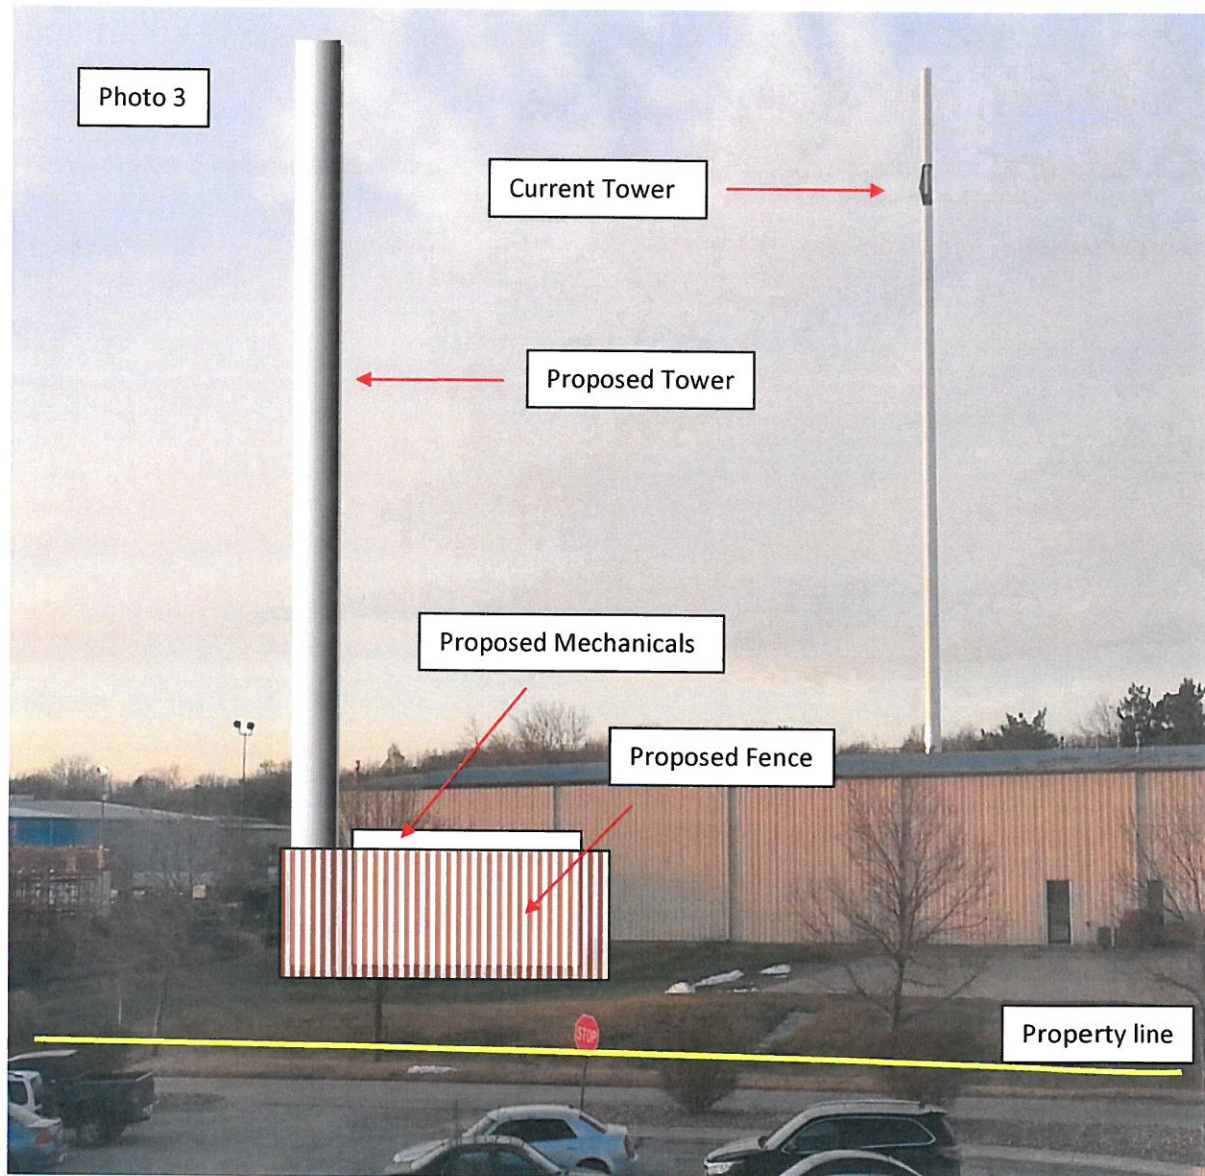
shows current tower, proposed tower, proposed mechanical building and proposed wood fencing in relation to Windsor's property line.
